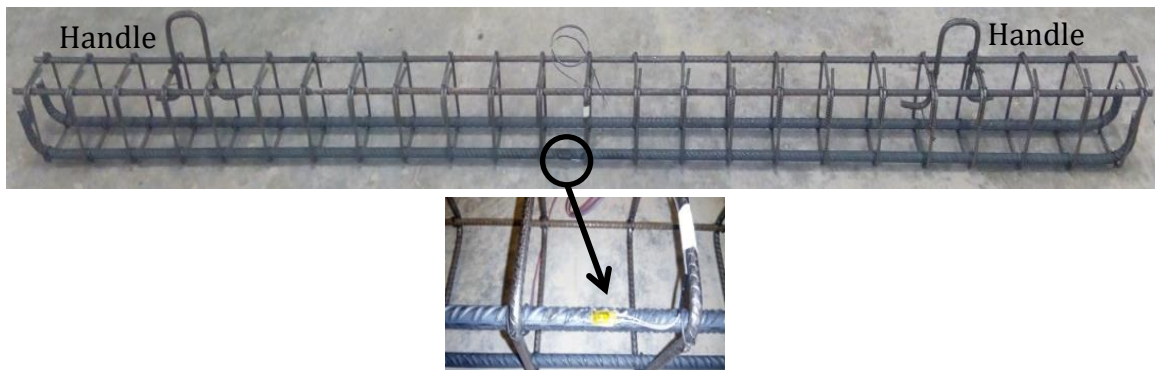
Steel reinforcement cage and instrumentation of tension steel strain gage.
